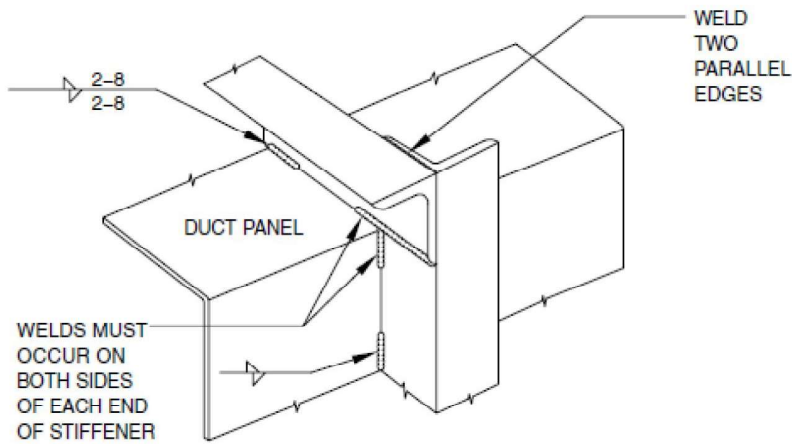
Fixed Reinforcement Stiffeners (Back to Back - Heel Down)
